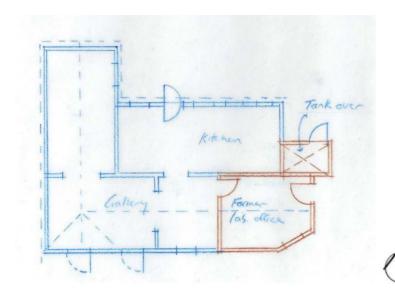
Mount Omei's former laboratory/ gallery floorplan sketched by Geoff Ashley (2016, p28) (no. '5' in site plan in Image 1.1).
